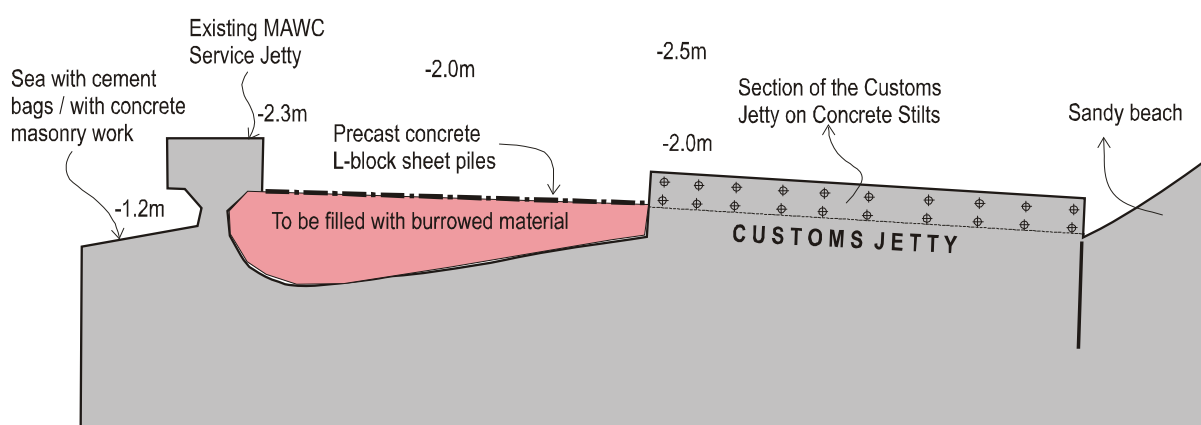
Detailed plan view of the project area. The area will be filled with the material borrowed from the adjacent areas
